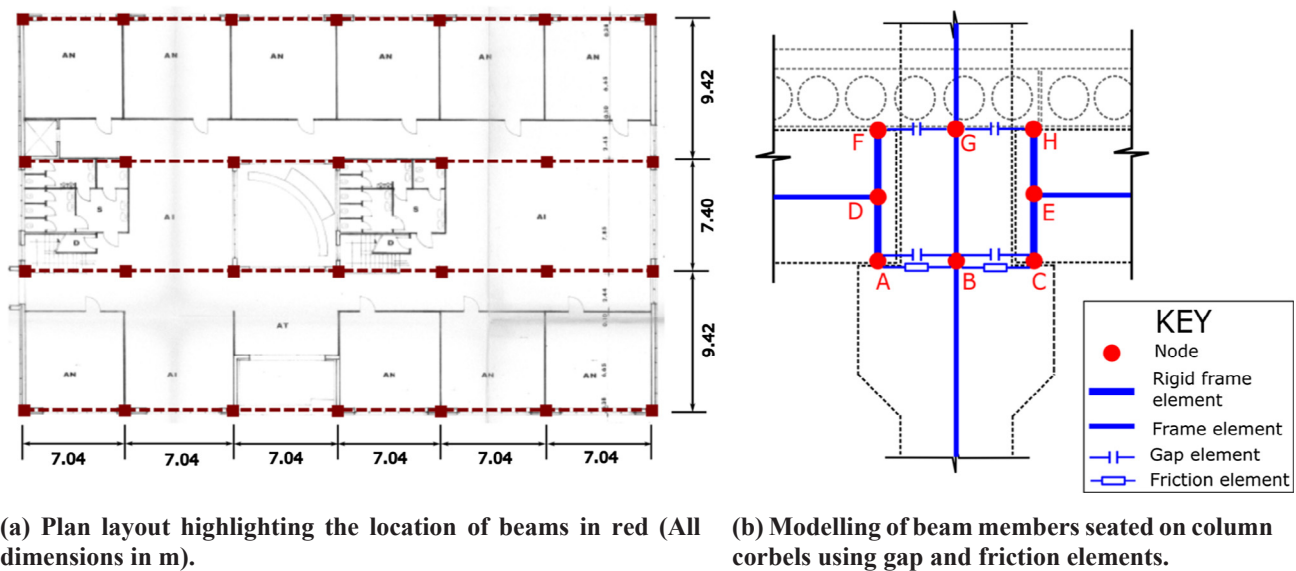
Illustration of the numerical modelling of the PC building. (a) Plan layout highlighting the location of beams in red (All dimensions in m). (b) Modelling of beam members seated on column corbels using gap and friction elements. (For interpretation of the references to colour in this figure legend, the reader is referred to the web version of this article.)
